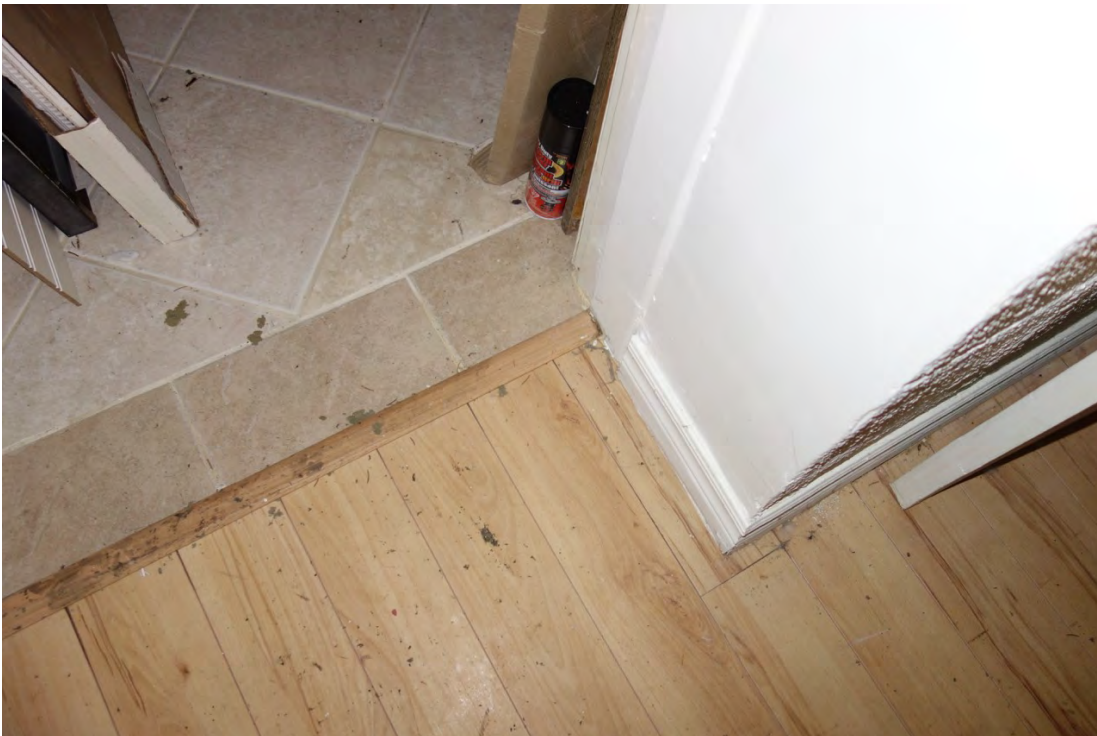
24 Ann Street - INTERIOR – BASEMENT – hallway and bathroom – laminate and tile flooring
